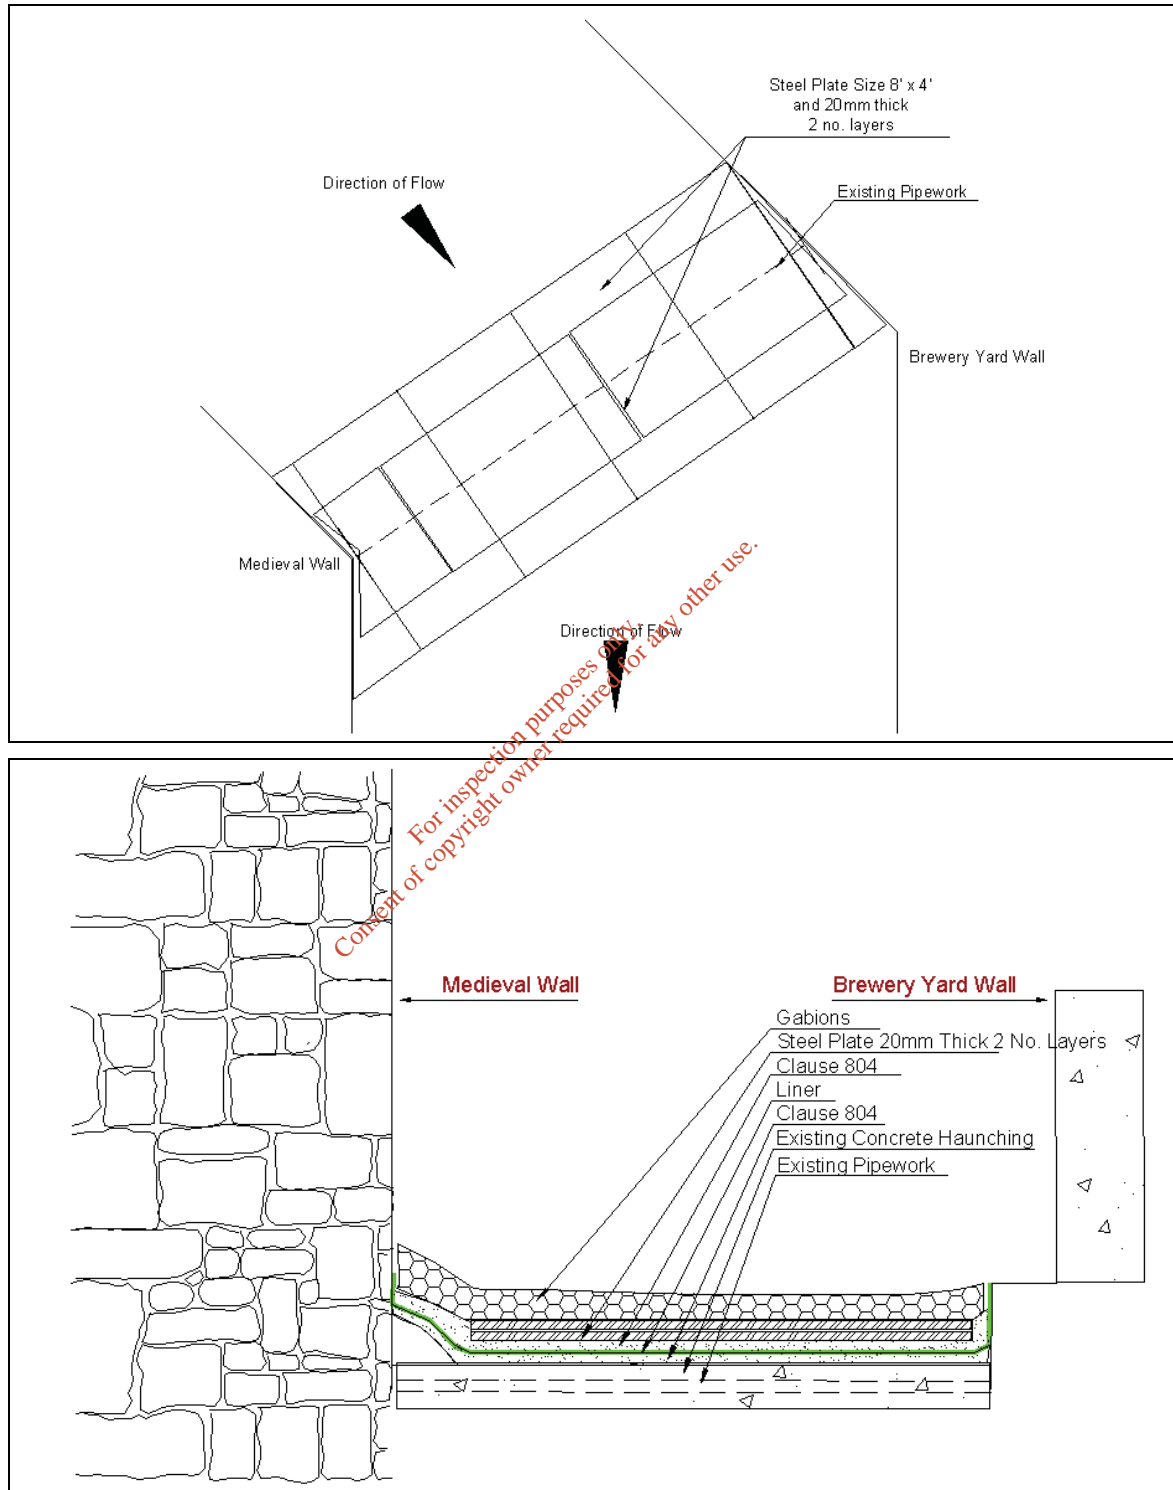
Details of Liner Installation at Chainage 128 (Pipe Crossing), Plan and Cross Section
